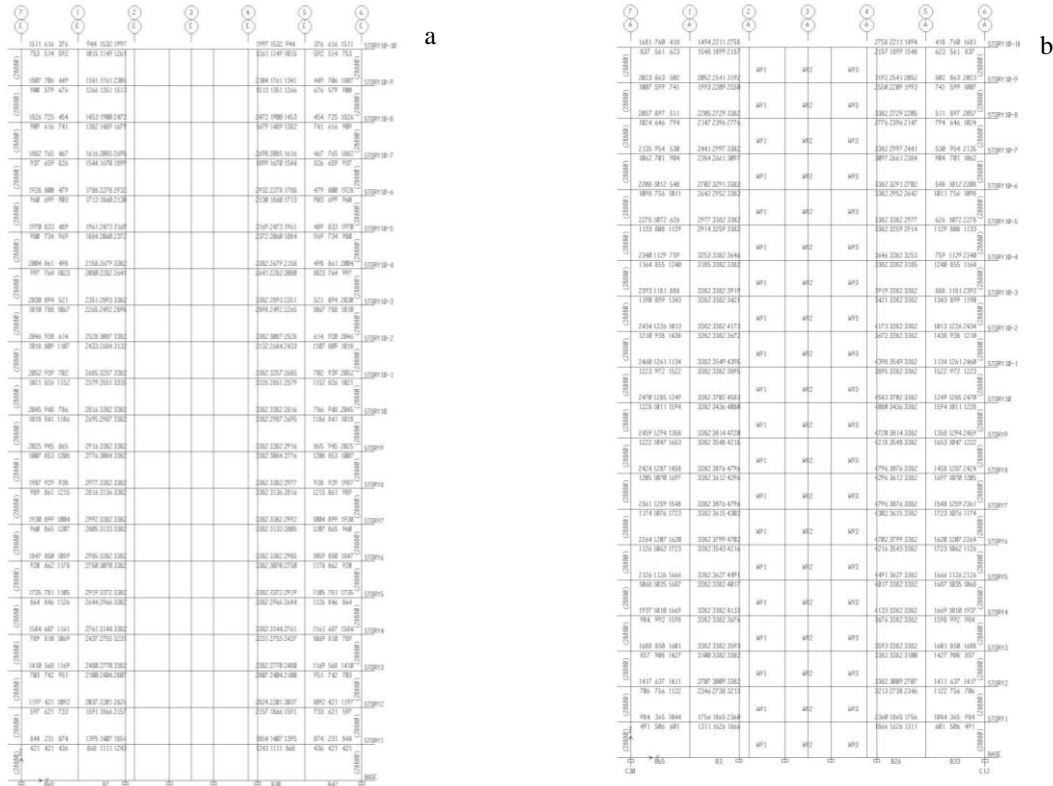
(a) Cross-section of rebar of beams from 20-V3 in mm, (b) Cross-section of rebar 20-V4 beams in mm.
